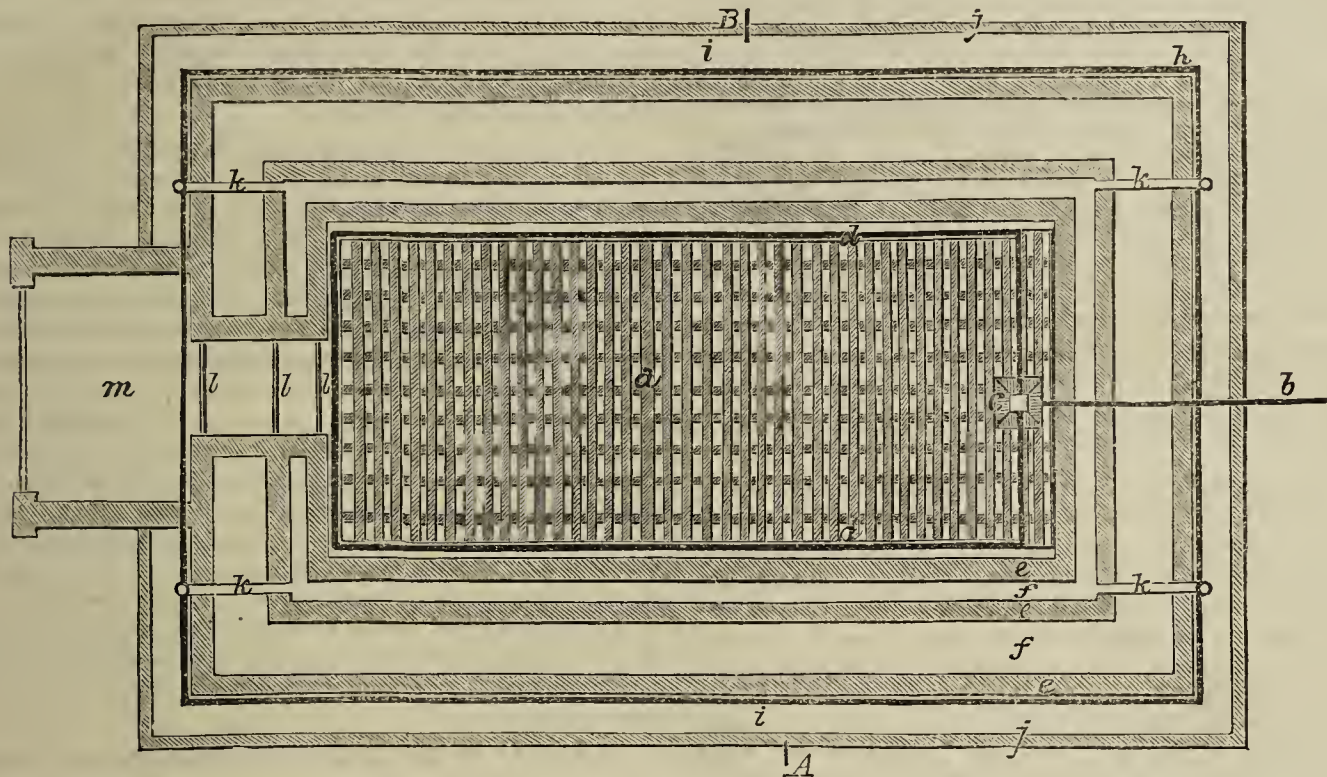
SCALE 8 FEET TO 1 INCH.
